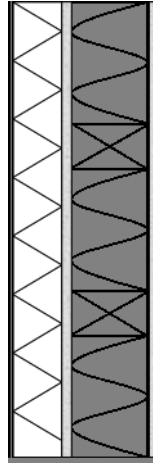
A schematic picture of a cross section of ETICS. From the left (outside) to the right (inside) the construction consists of following layers: 3-5 mm layer of render, 50 mm expanded polystyrene, 9 mm gypsum board, 145 mm x 45 mm wood studs c/c 600 and 145 mm mineral wool, 0.2 mm vapour barrier and a 9 mm gypsum board.
